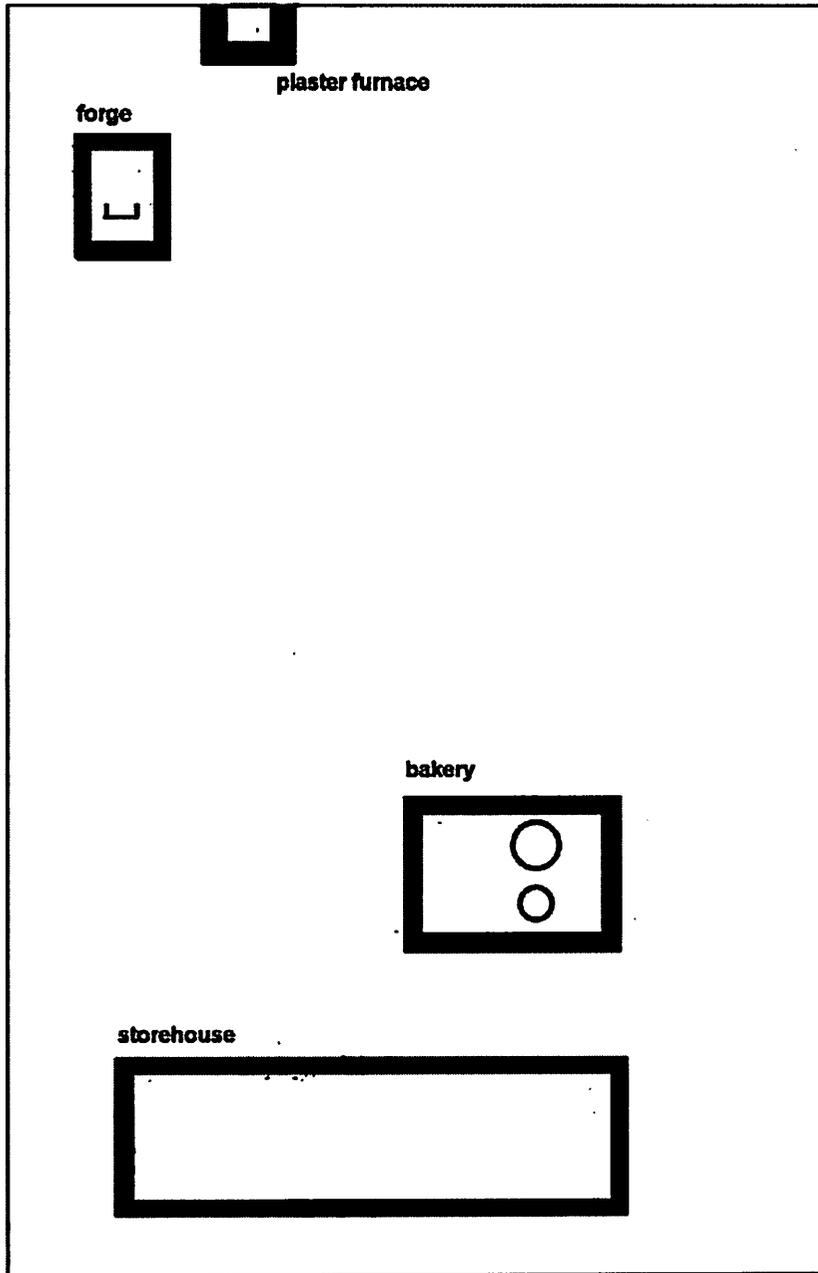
Revised plan based on: Plan of finished buildings [Batimens], and works Securely at the Port Dauphin on Isle Royale in 1715. (715-2)
